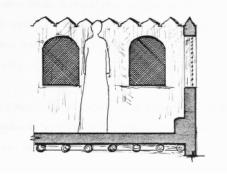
Kharja* surrounded with high parapet walls. Pierced by arched openings with wooden grill-work. (Al-Lyaly, 1990, p. 67).
